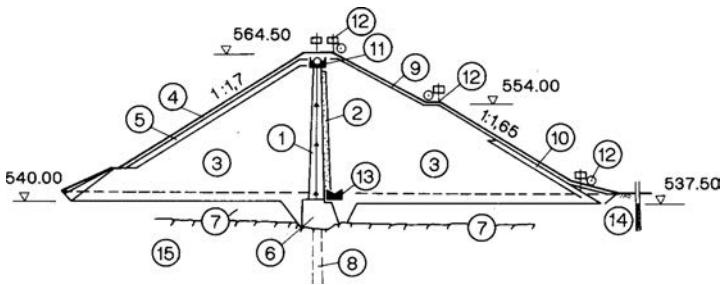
Cross-section of Falkenstein dam (Girod et al., 1994). (1) Reinforced concrete internal wall; (2) filter layer 0.8 m; (3) shells of phyllite schist; (4) coarse rockfill for the slope protection, 0.8 m; (5) transition layer, 0.6 m; (6) concrete foundation; (7) river gravel; (8) two-row grout curtain; (9) grassed protected layer, 0.2 m; (10) transition layer, 0.8 m; (11) plum-line well; (12) measuring points for aligning and leveling; (13) measuring system for seepage waters; (14) observation for the underground water level; (15) phyllite, damaged at surface.
